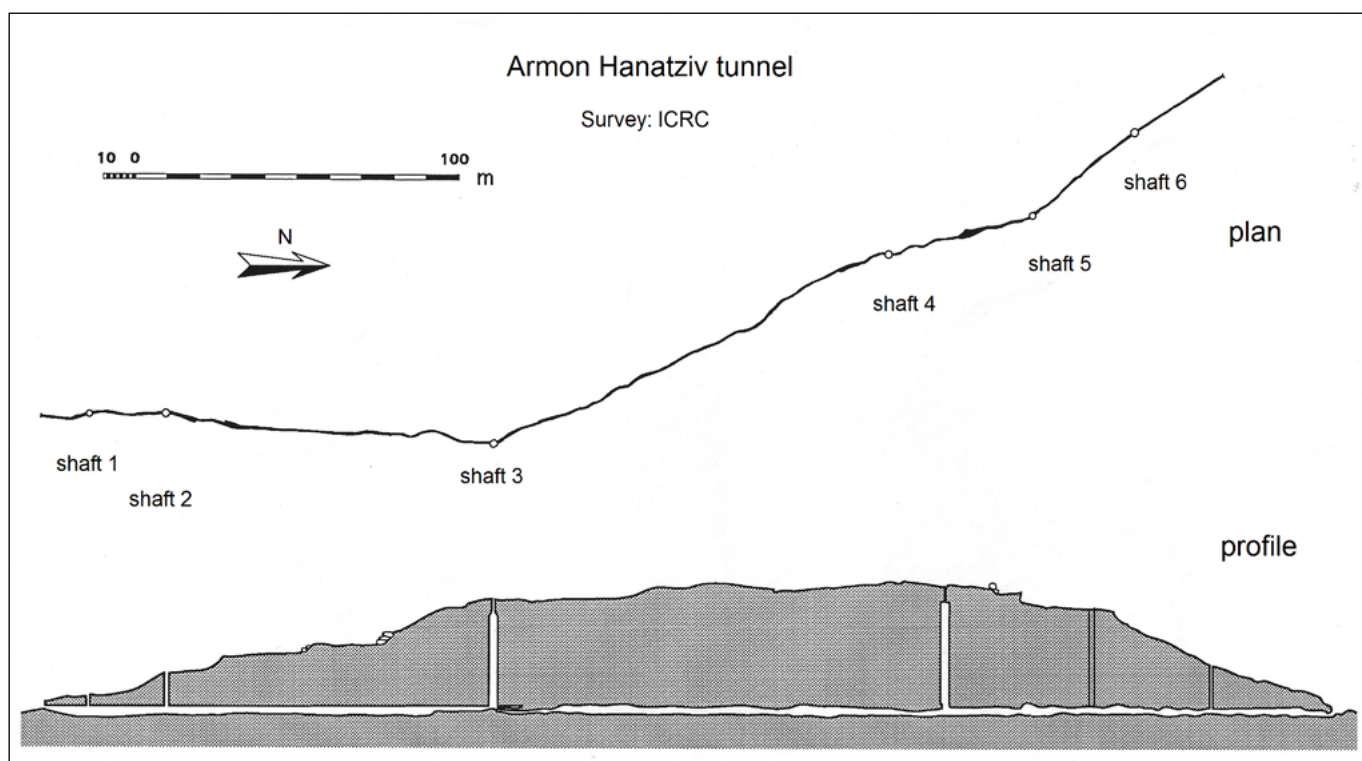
Armon Hanatziv tunnel, plan and profile. Meeting points are hard to observe, and the deviations at meeting points are negligible.
